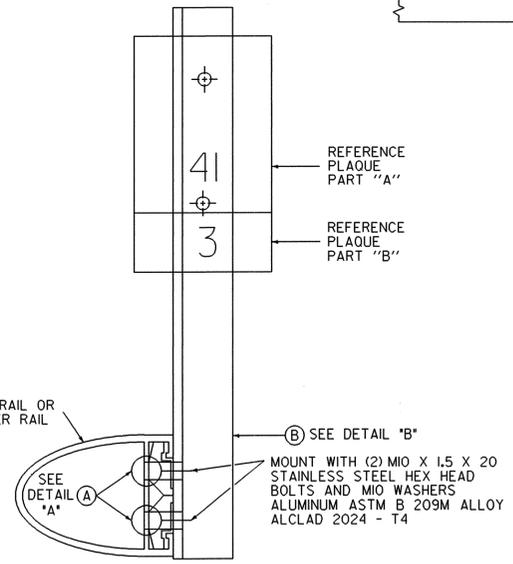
DETAIL FOR MOUNTING ON BOX BEAM BRIDGE RAIL
